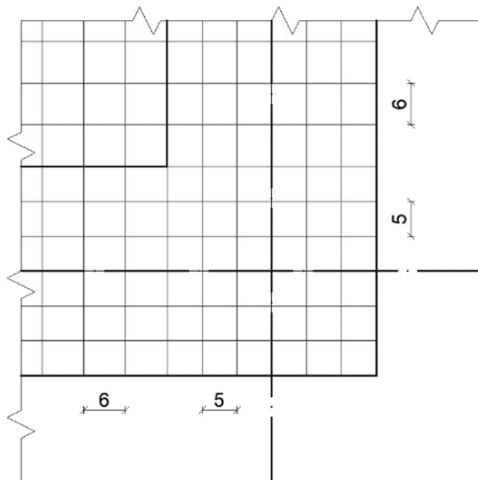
Plan dimensions of the 3D mesh at floor cell corners.
